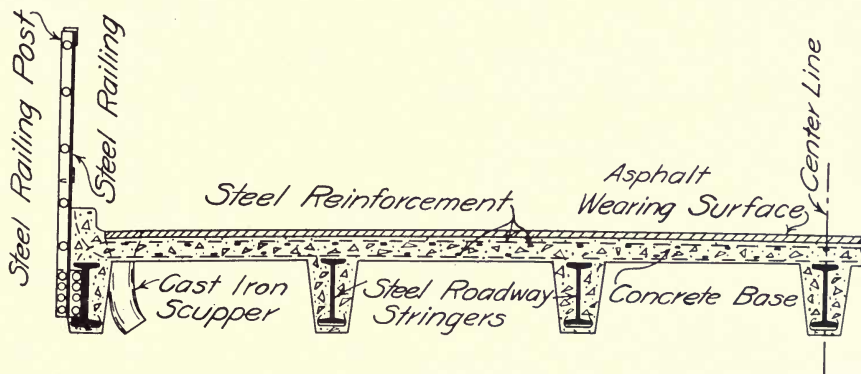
REINFORCED CONCRETE ROADWAY FOR STEEL SPANS.
